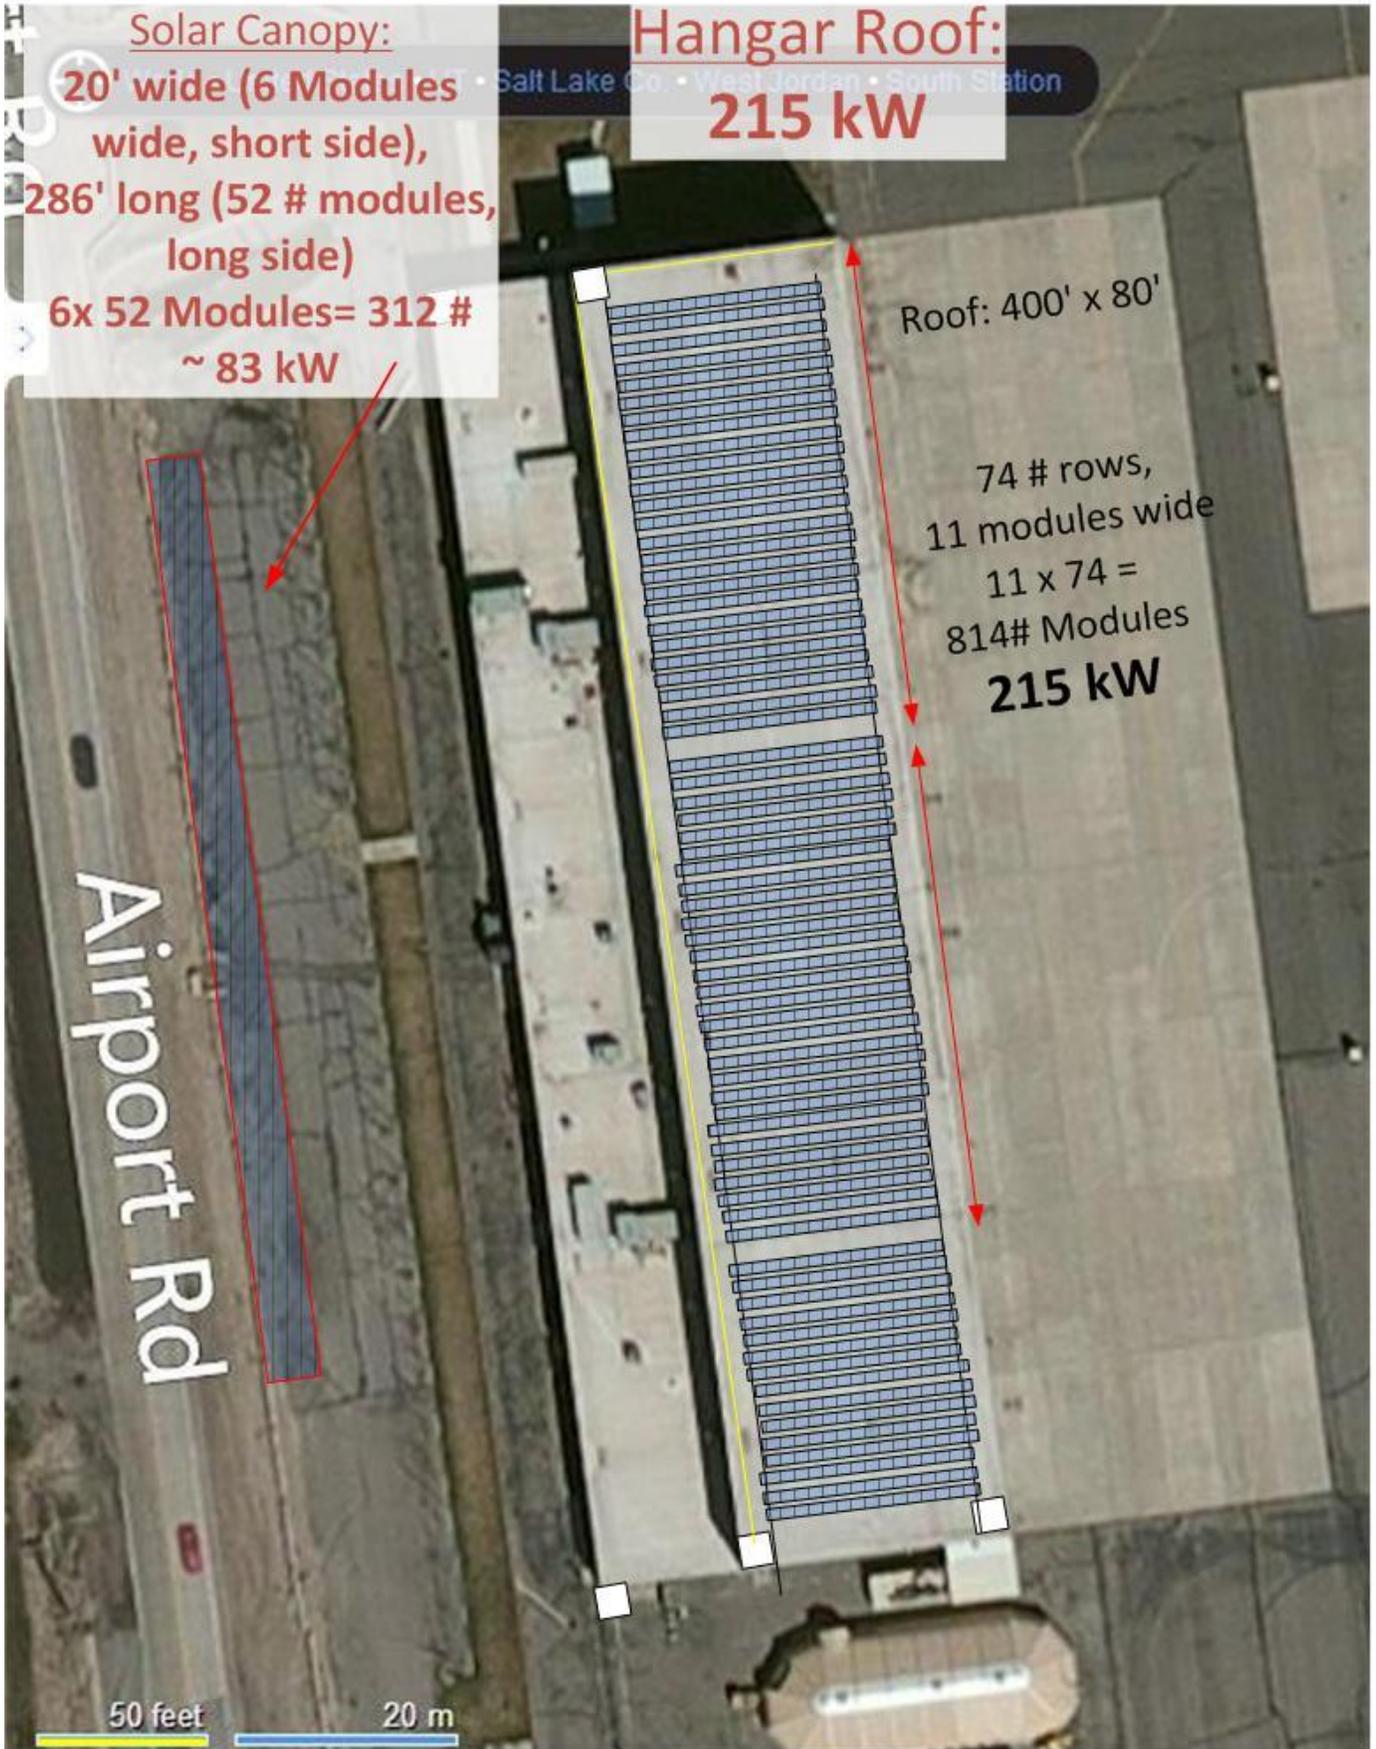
Preliminary Lay-out Sketch of a Low-Profile Solar Roof Mount (Roof Dimension 400' x 80'; EPDM) and Parking Canopy, West of the Hangar Building
